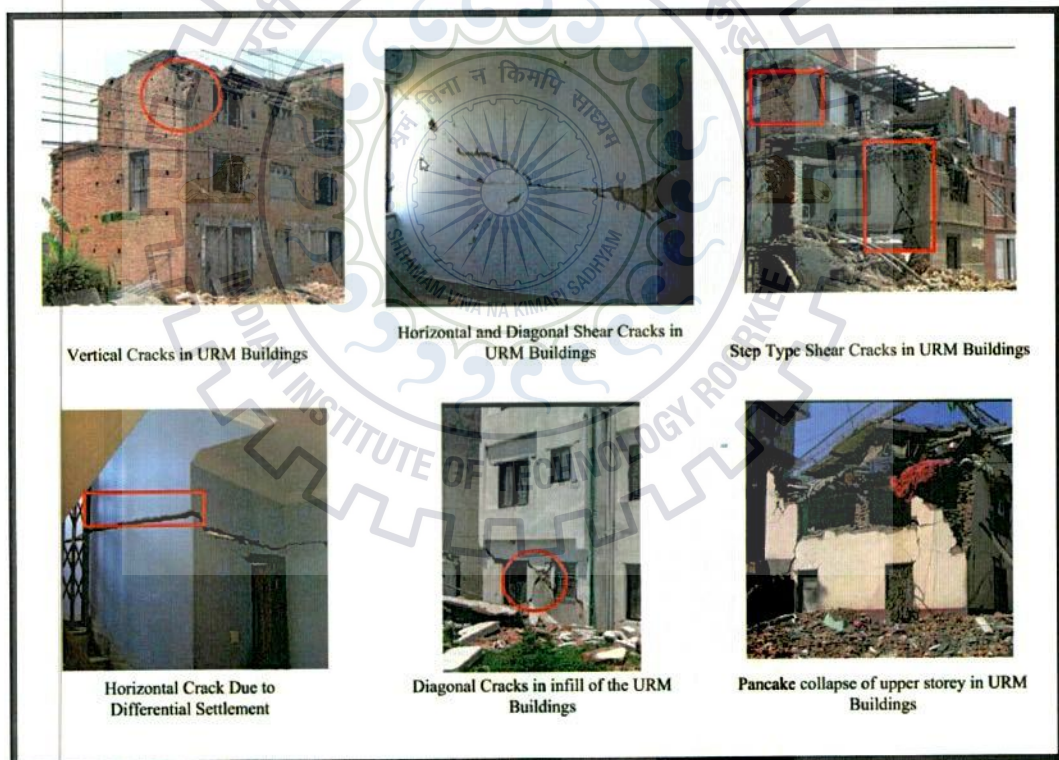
Various types of Cracks and Failures in Brick Masonry Buildings in Bihar after Gorkha Earthquake 2015
